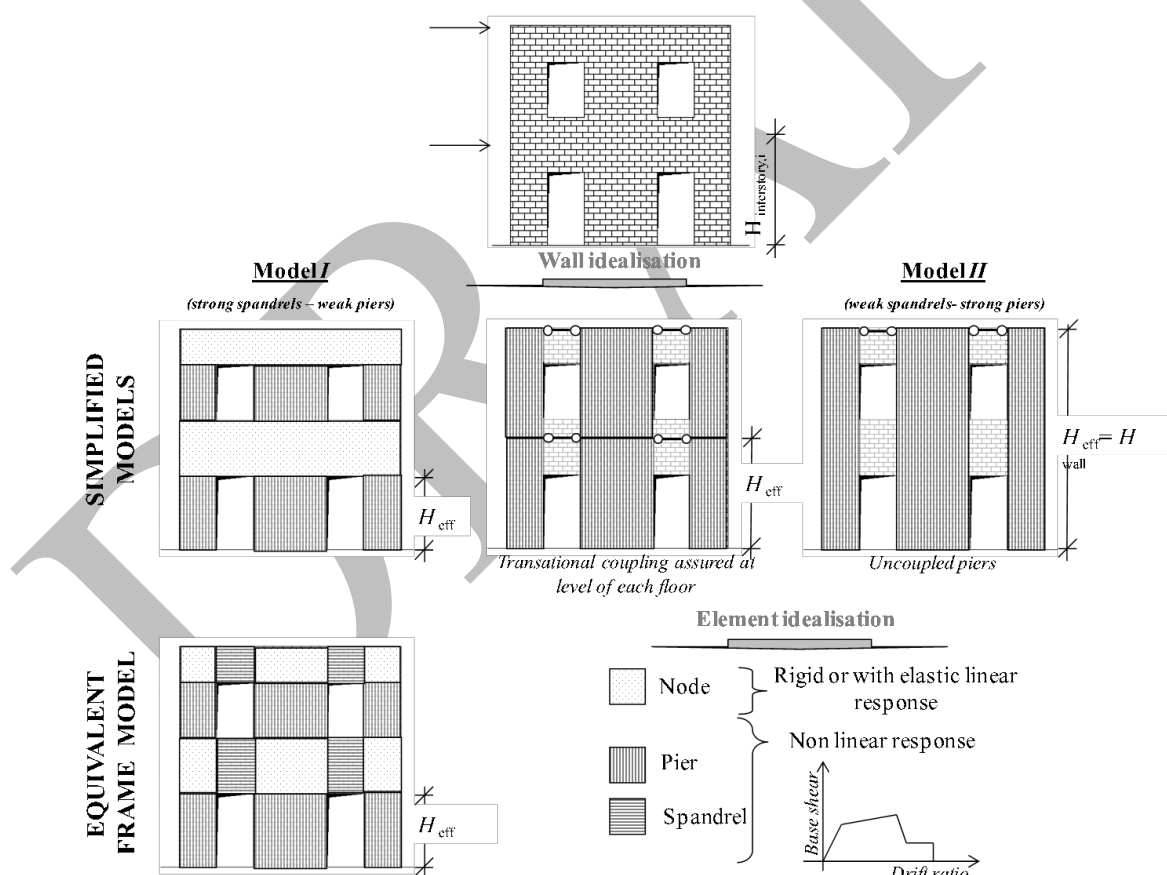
Examples of different modelling approaches to simple walls (from Cattari and Lagomarsino 2008).
